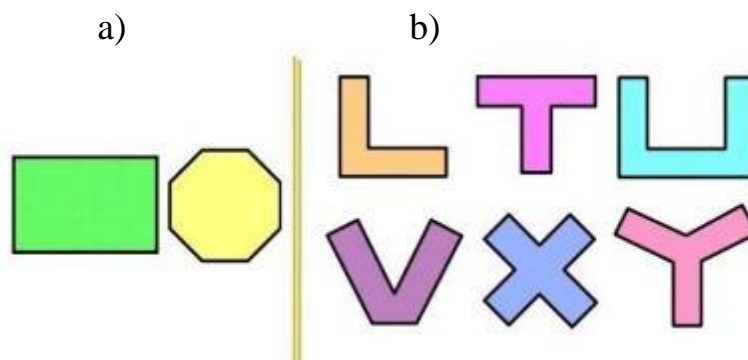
Examples of spatial planning solutions for buildings:
